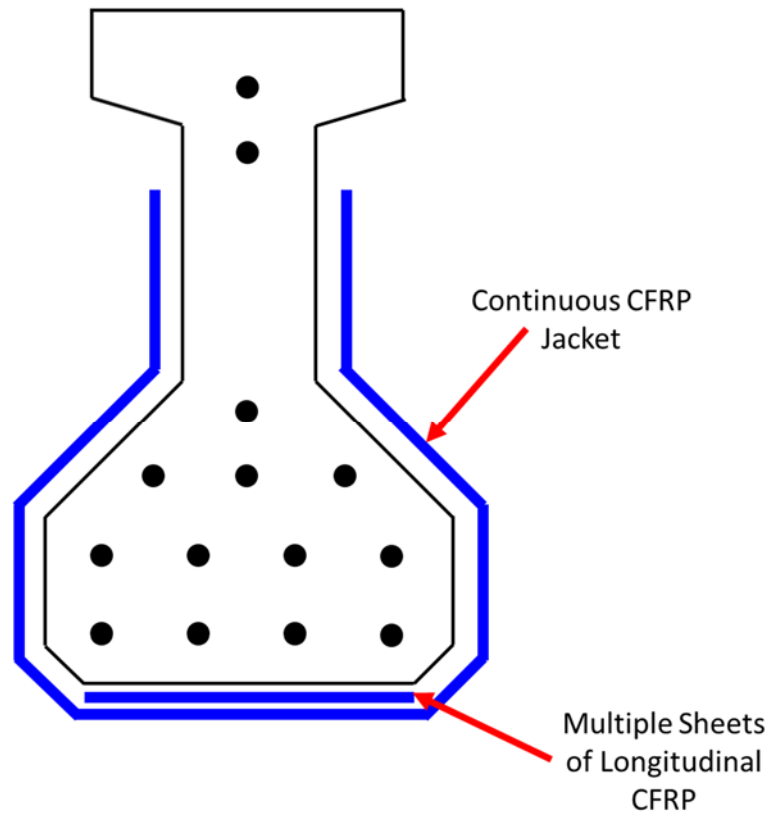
Bonded CFRP flexural patch configuration.
